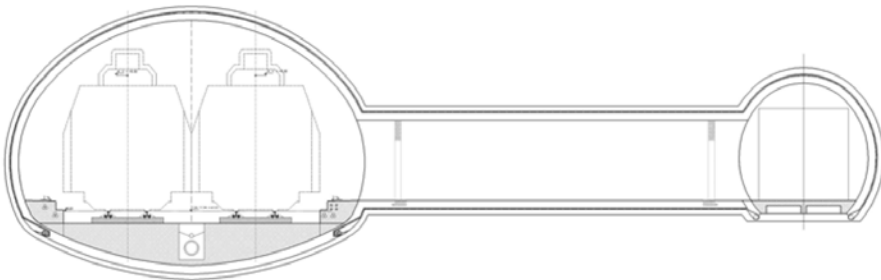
Double-track tunnel tube with the connection to the service tunnel, [3]
